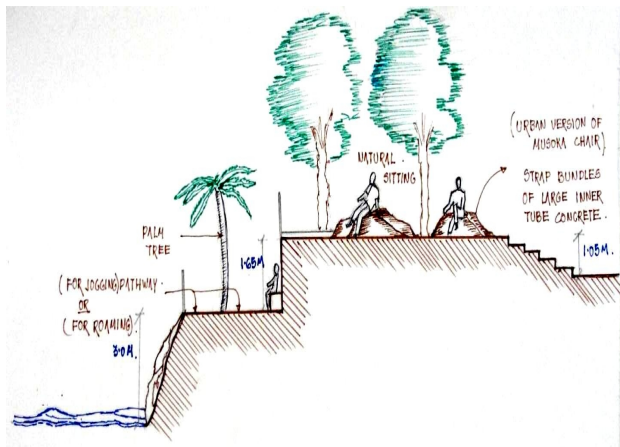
Conceptual Cross section of proposed promenade through natural sitting.
